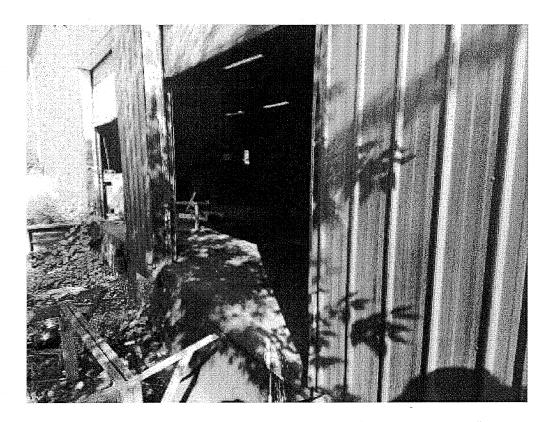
(Bay doors) : Bay doors to coating area with overspray on walls.
